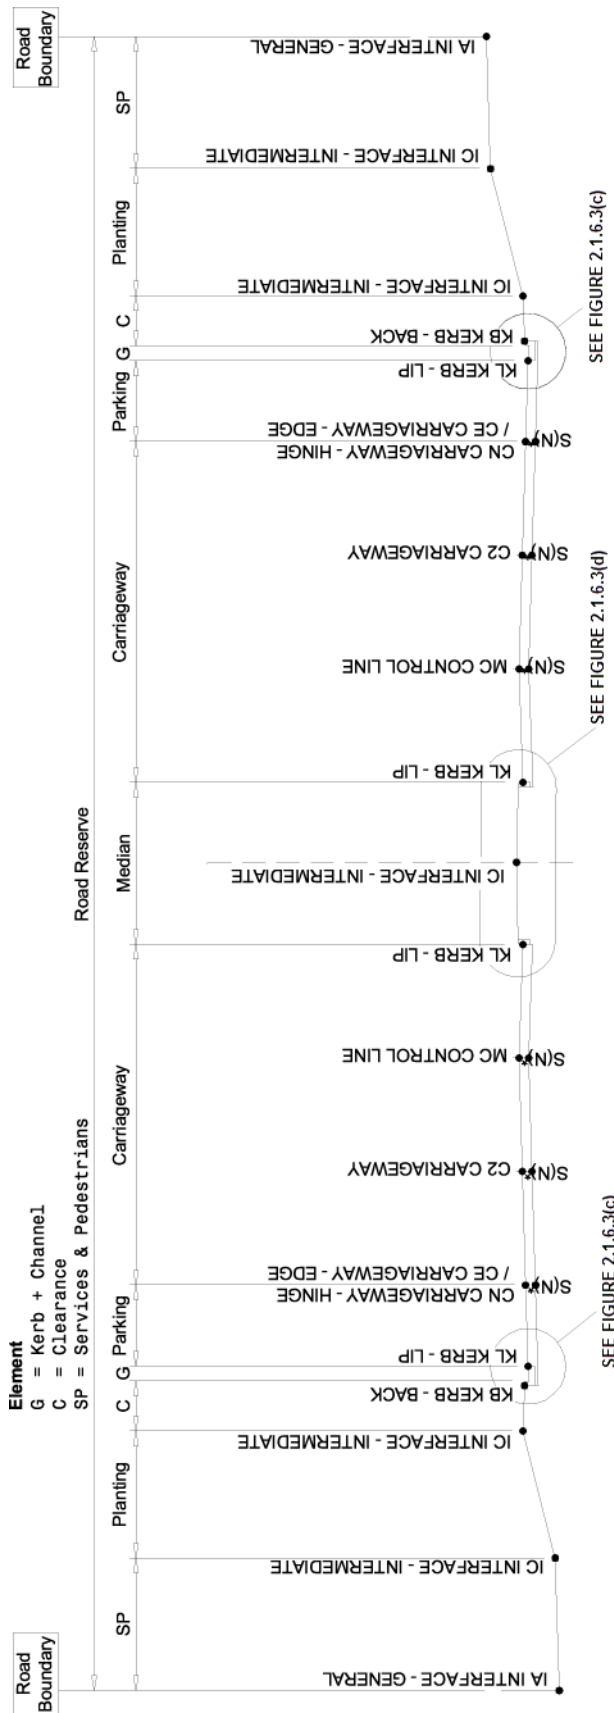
(d) – Typical cross section of multilane urban road
